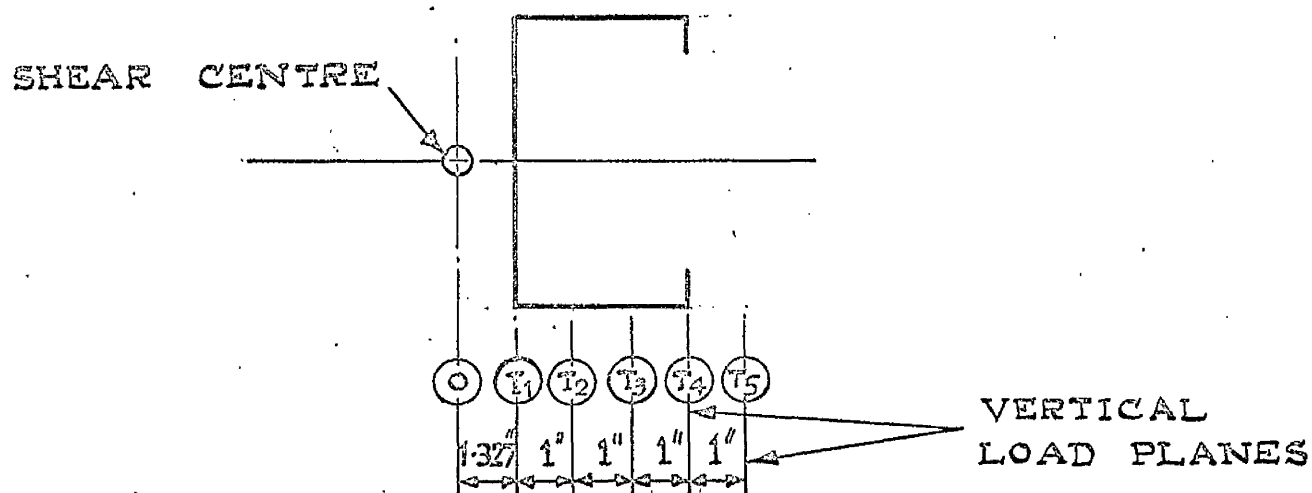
LOCATION OF VERTICAL LOAD PLANES FOR THE THIN - WALLED LIPPED CHANNEL SECTION BEAM TESTS.
